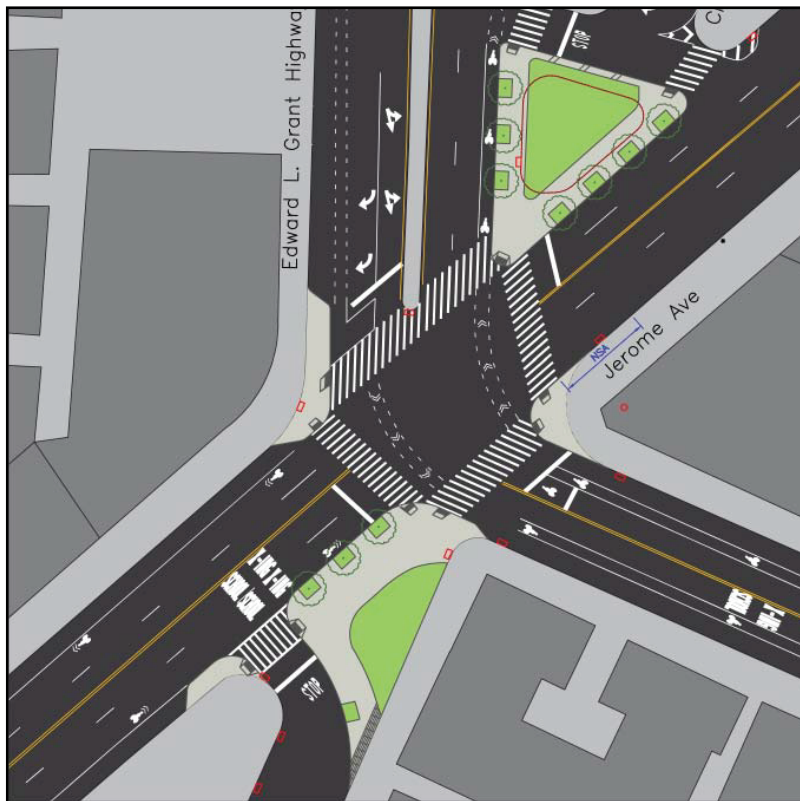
167th Street and Jerome Avenue proposal 2
